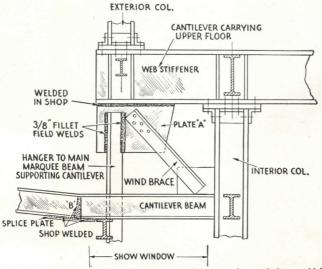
Section view of cantilever construction over show windows which supports marquee and exterior columns for upper floors.
